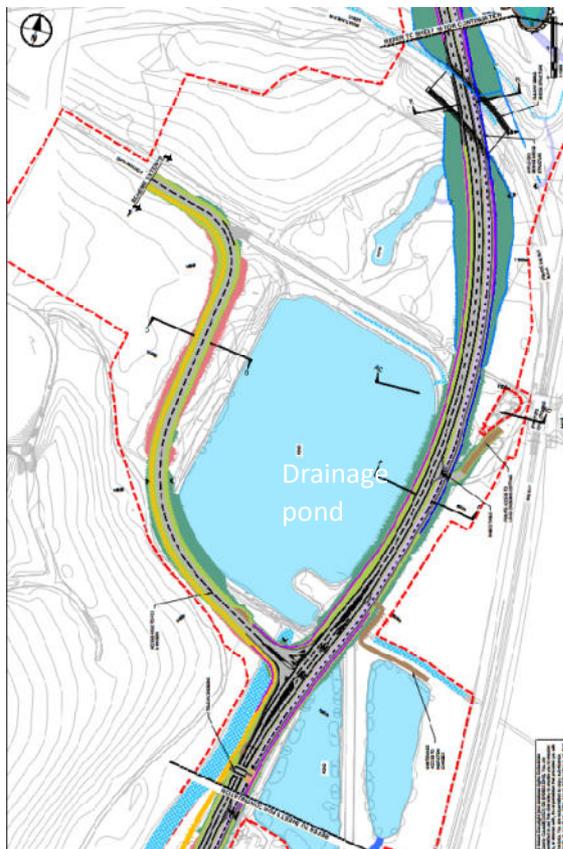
HIF1 proposed Road alignment south of Appleford Sidings. Showing branch road around perimeter of drainage pond.
